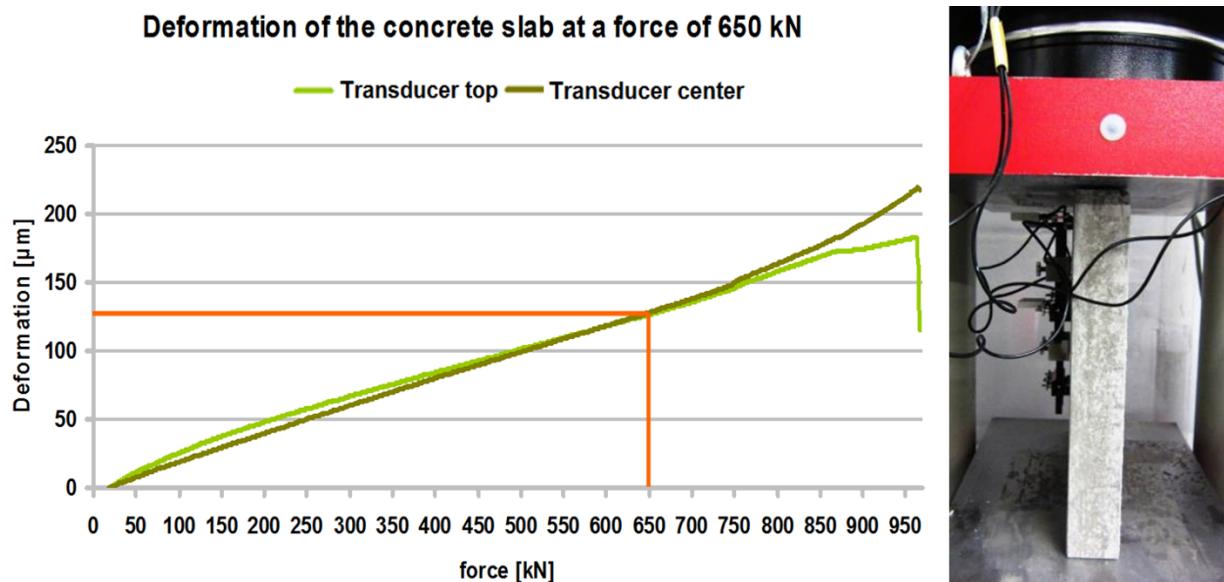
Hydraulic press loaded with laid tiles on a concrete block.
